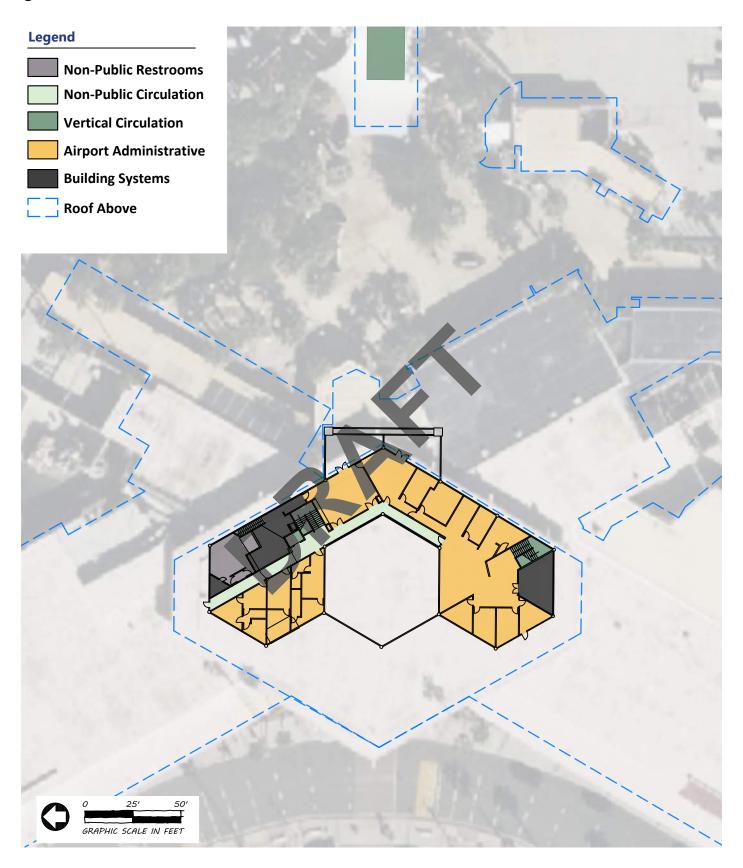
Terminal Floor Plan - Mezzanine Level
